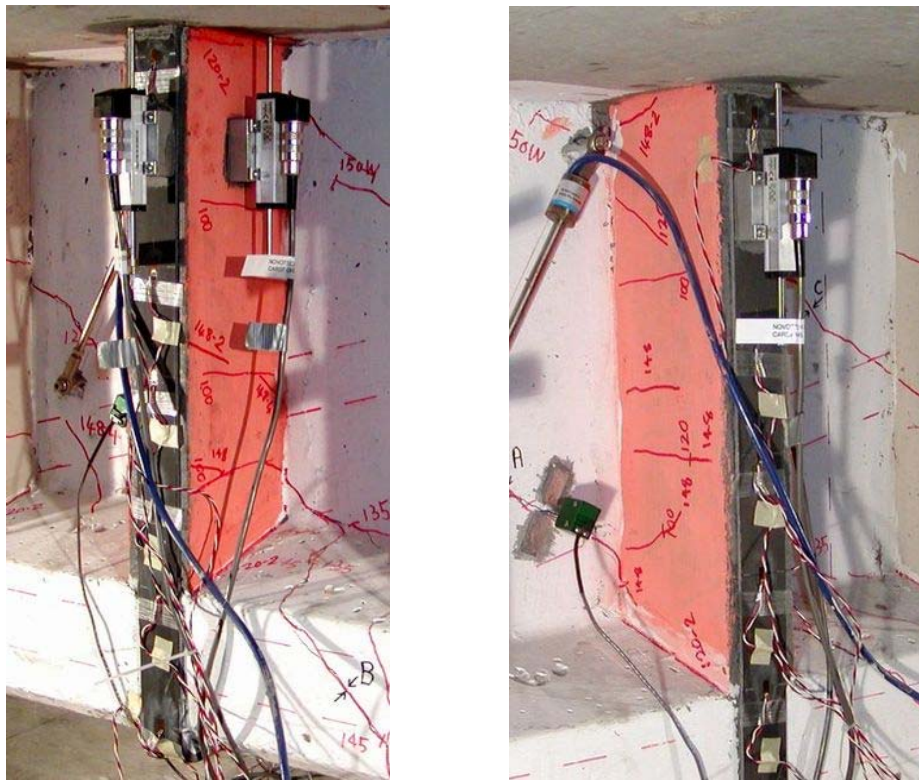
Cracks formed in the FRCC filler block of stirrup F3
